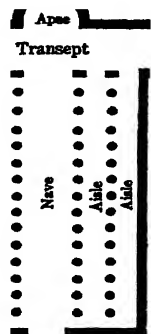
GROUND PLAN OF A BASILICAN CHURCH.
